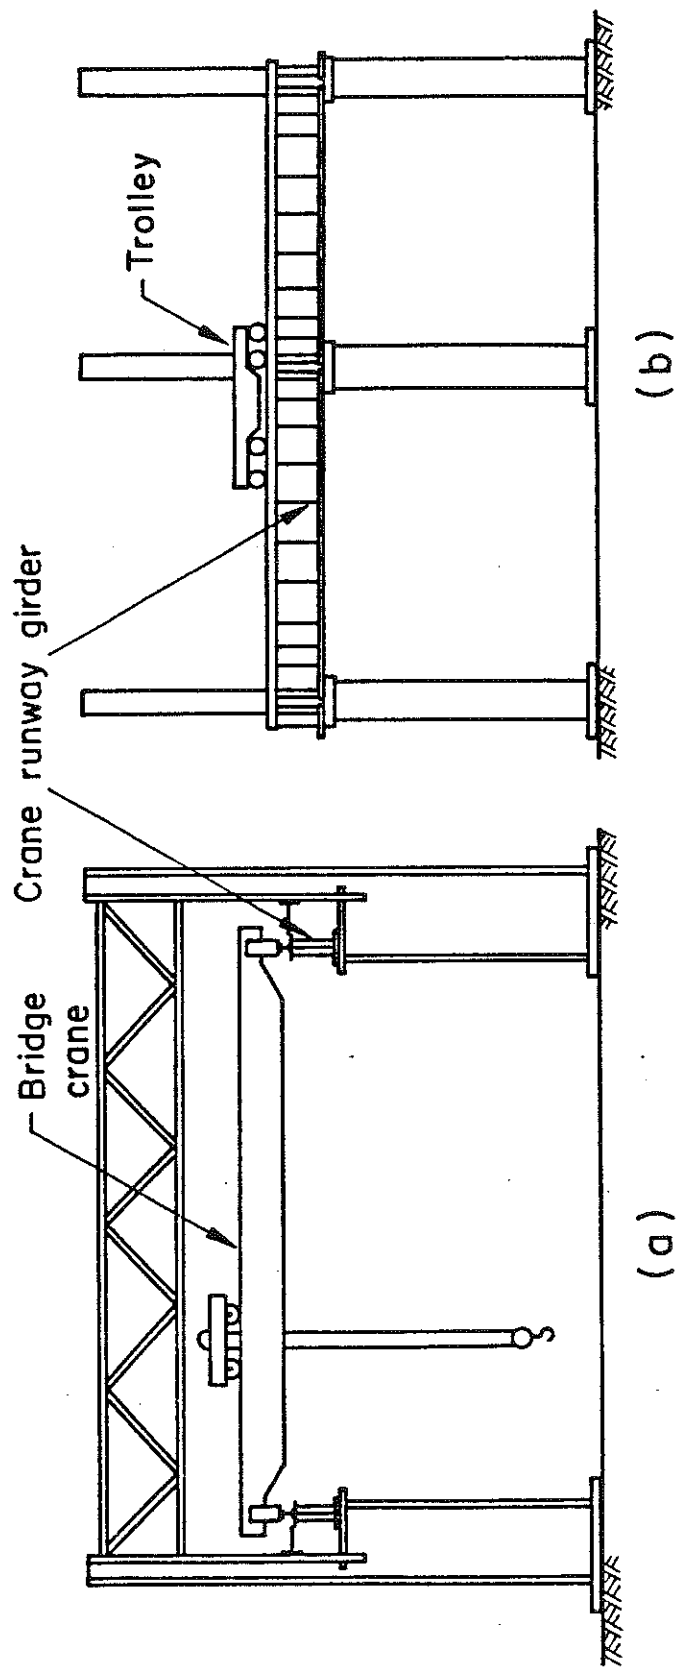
Crane runway structure. a) End-on view of runway; b) Elevation of section of runway.
